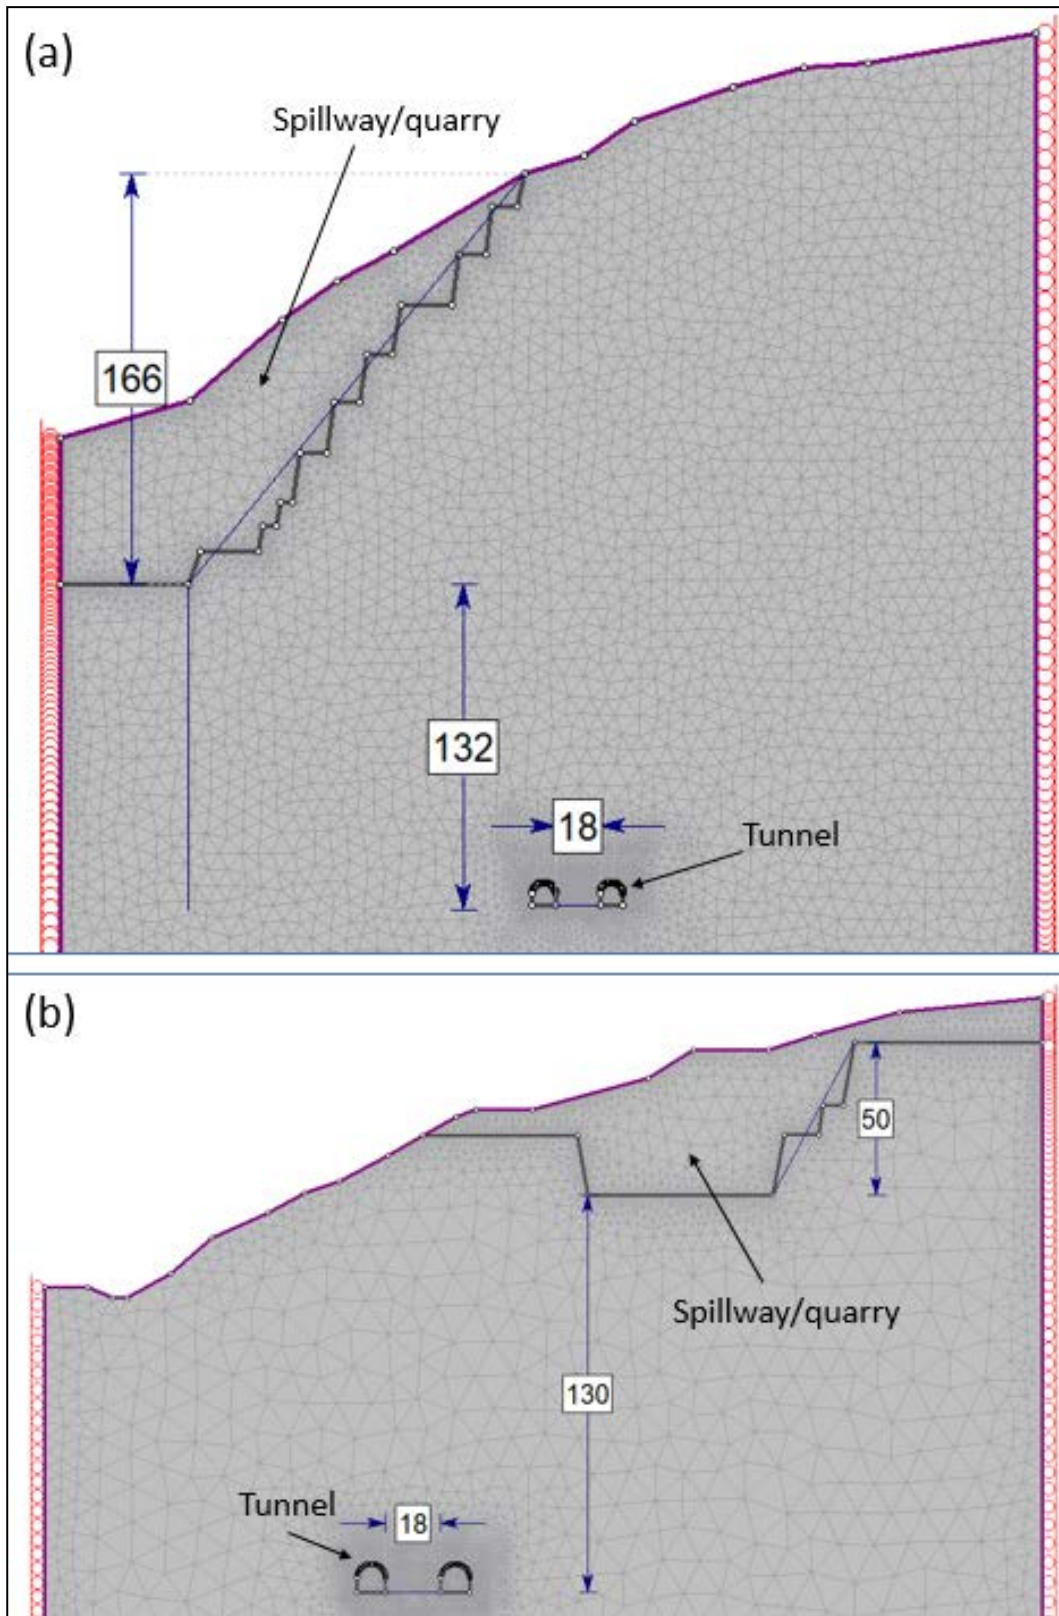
Analysis sections for diversion tunnels: a) Section 1; b) Section 2
